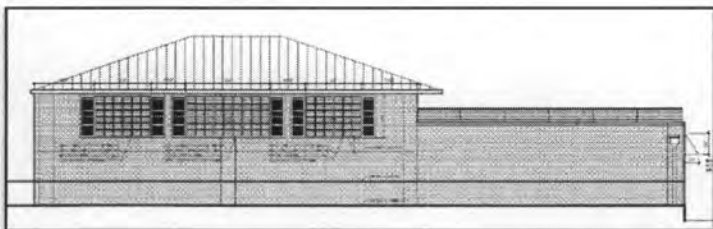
Showing planned improvements including windows and shutters which Grantor seeks to install in the south-facing wall of 217-219 N. 9th Street
